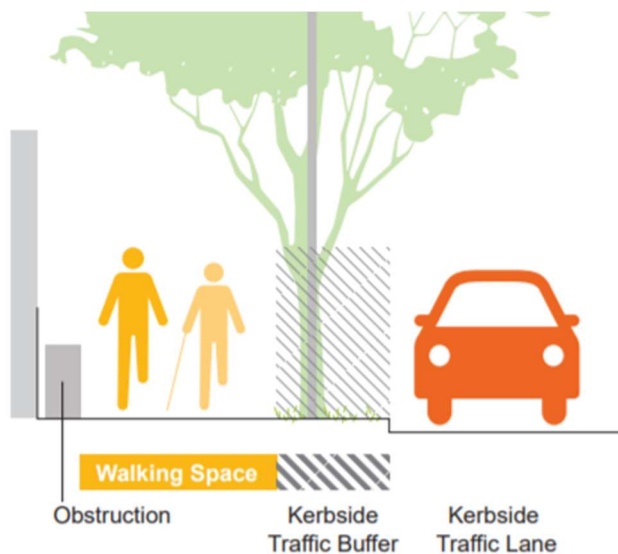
Example cross section, showing the impact of obstructions and kerbside traffic buffer on Walking Space (Source: Walking Space Guide, TfNSW)
